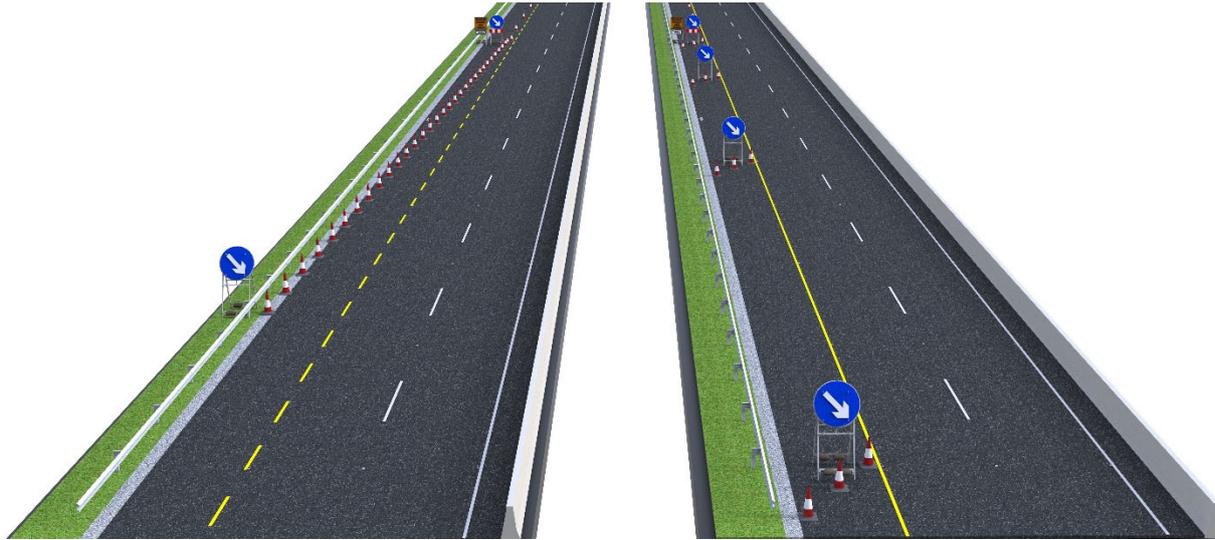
(a) Dual Carriageway Taper and
